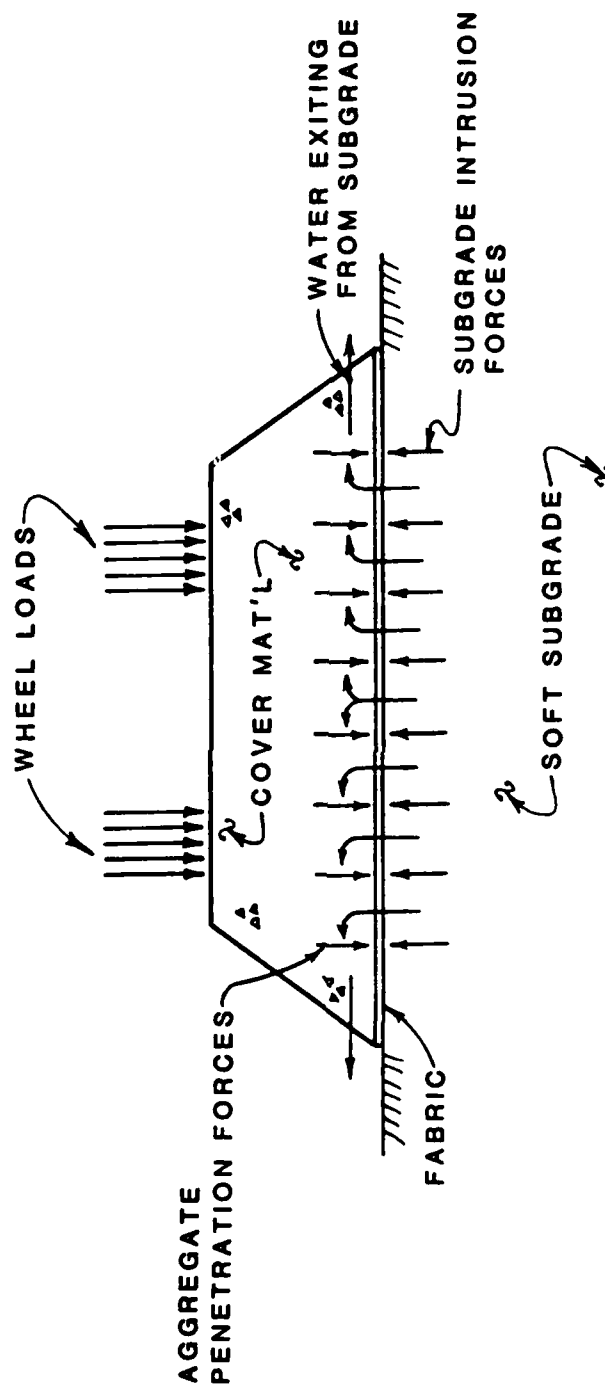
Concept of geotechnical fabric as a separation medium, preventing subgrade intrusion and deterioration of planned road design.
